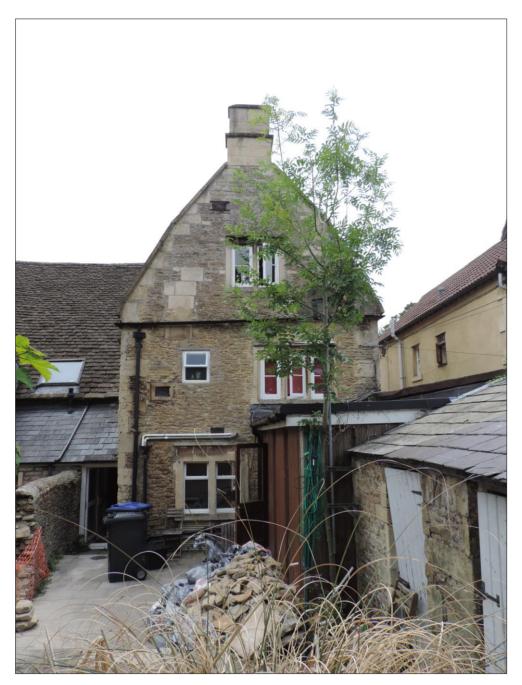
Southeast facing view of rear elevation. Chimney doors are visible to the north of the elevation and a modern bathroom window has been inserted close to the line of the flue. Modern timber annex and outbuildings are visible to bottom right of the photo.
